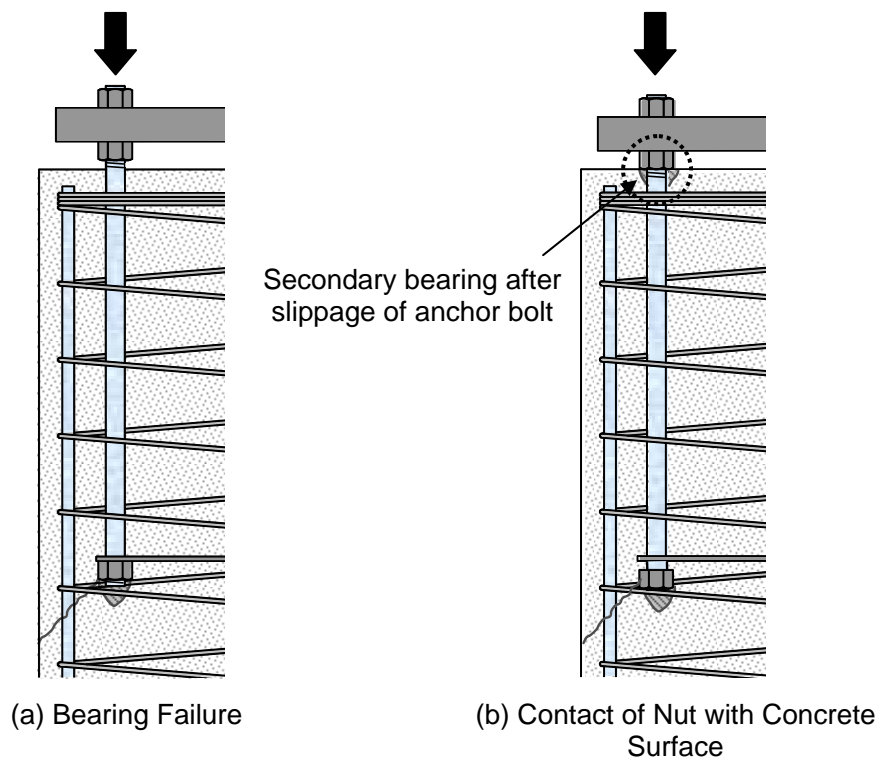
Compressive Failure of Anchor Bolt
